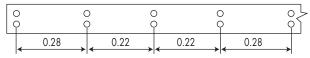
B - Bridging Positions - End Spans (unlapped)
